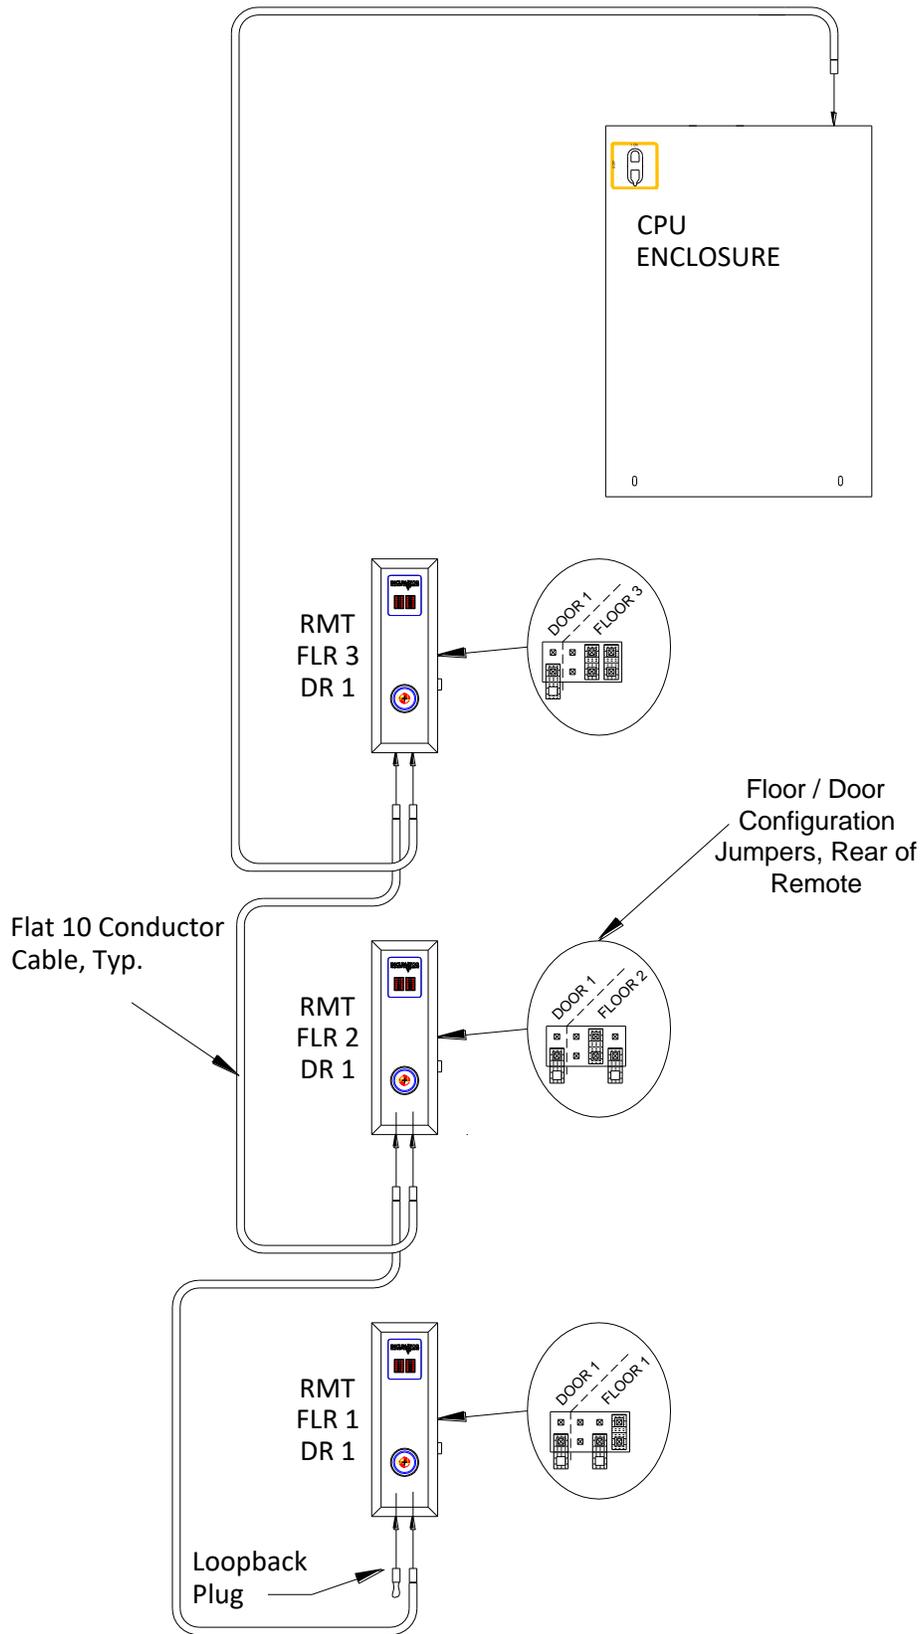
CPU ENCLOSURE - ATTIC MOUNT, 3 FLOORS, 1 DOOR
